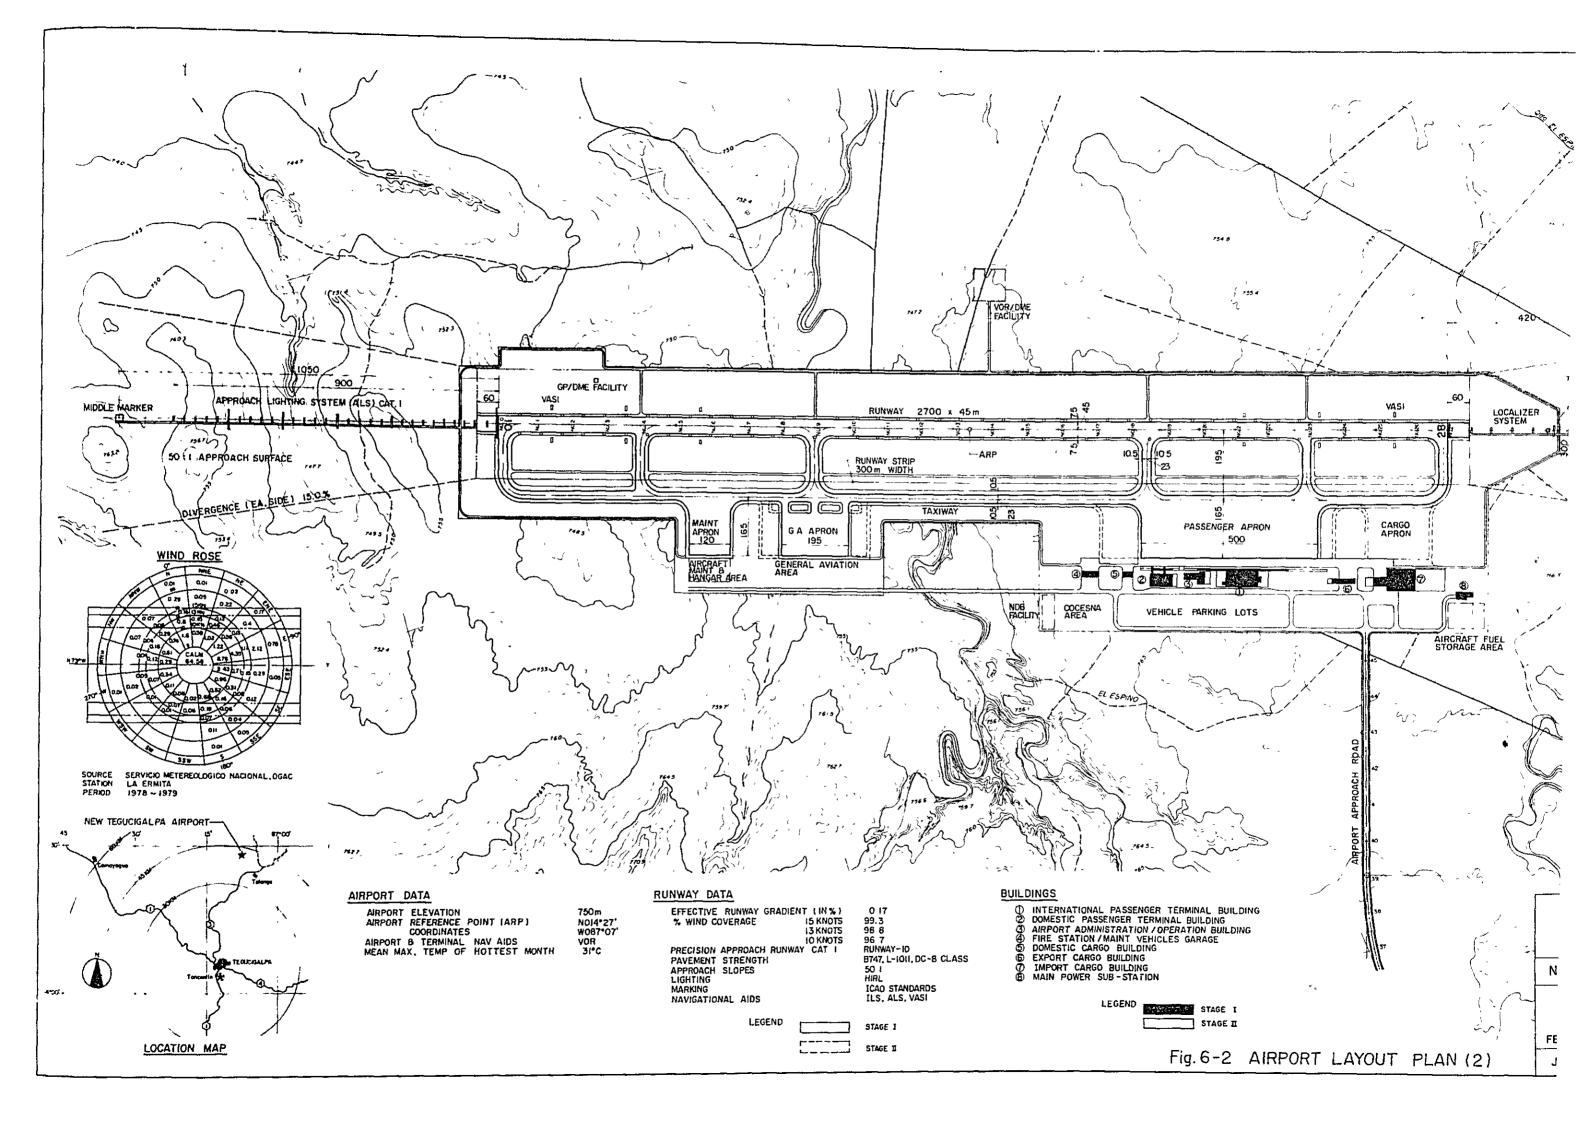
and 6-2 show the proposed airport facility layout plan for each stage.
